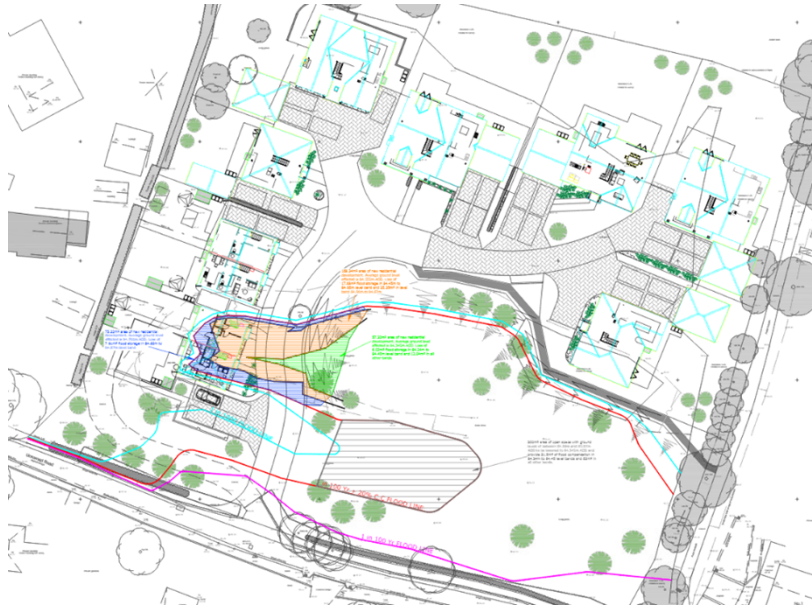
Site Survey and Modelled Flood Lines overlaid onto Proposed Site Plan.
